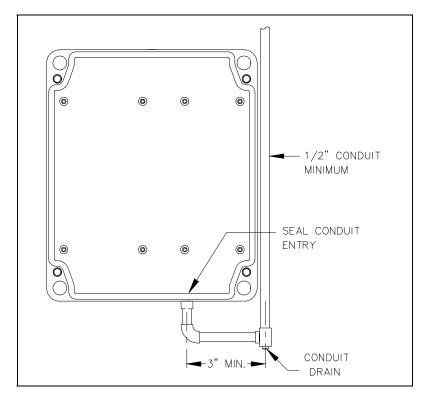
Bottom entry conduit installation details (RECOMMENDED for non-metallic enclosures)
